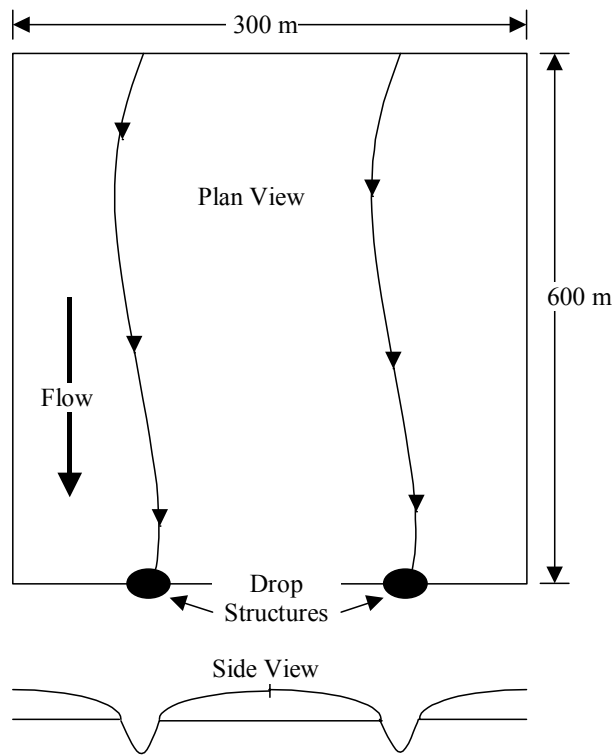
Plan and side views of the example waste rock pile upper surface showing contours and channels.
